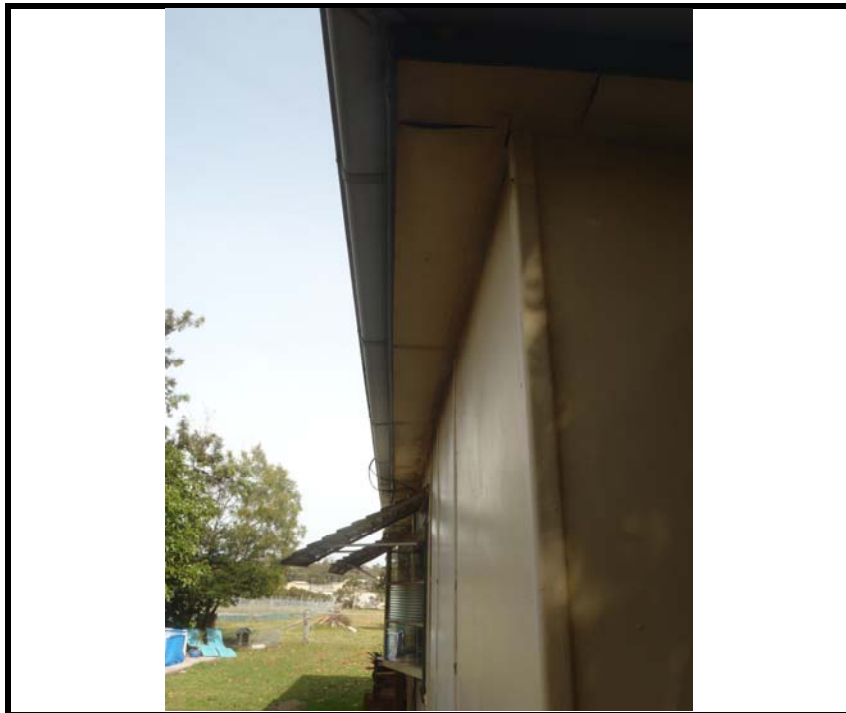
Section of the ACM sheeting eaves at 1 McLeod Road
